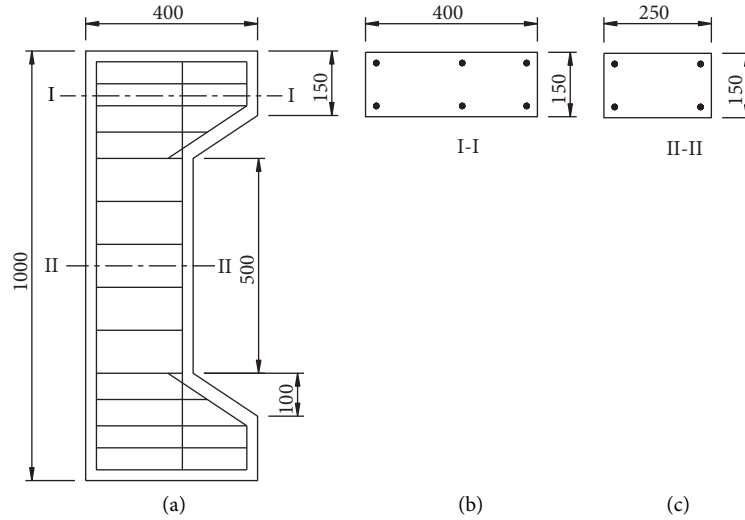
Schematic of specimen dimensions and reinforcement (mm).
